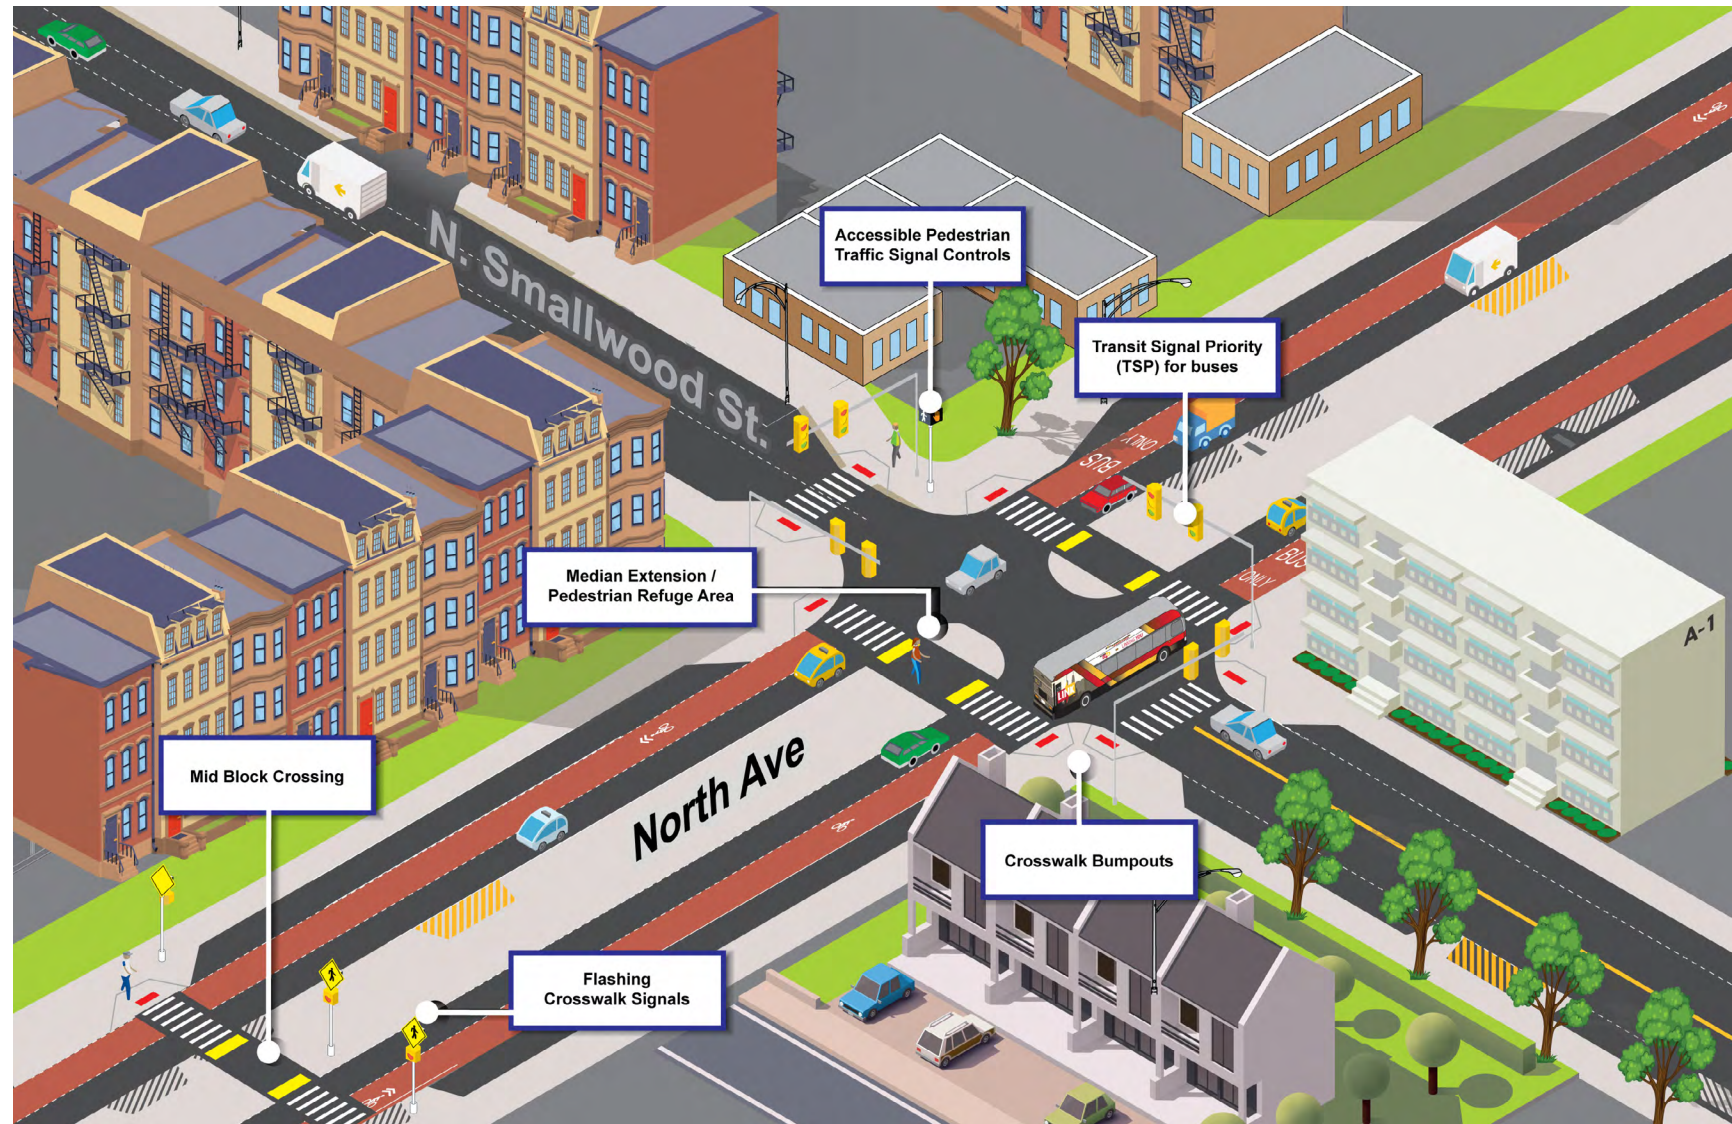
Safety interventions in place at West North Avenue & North Smallwood Street
